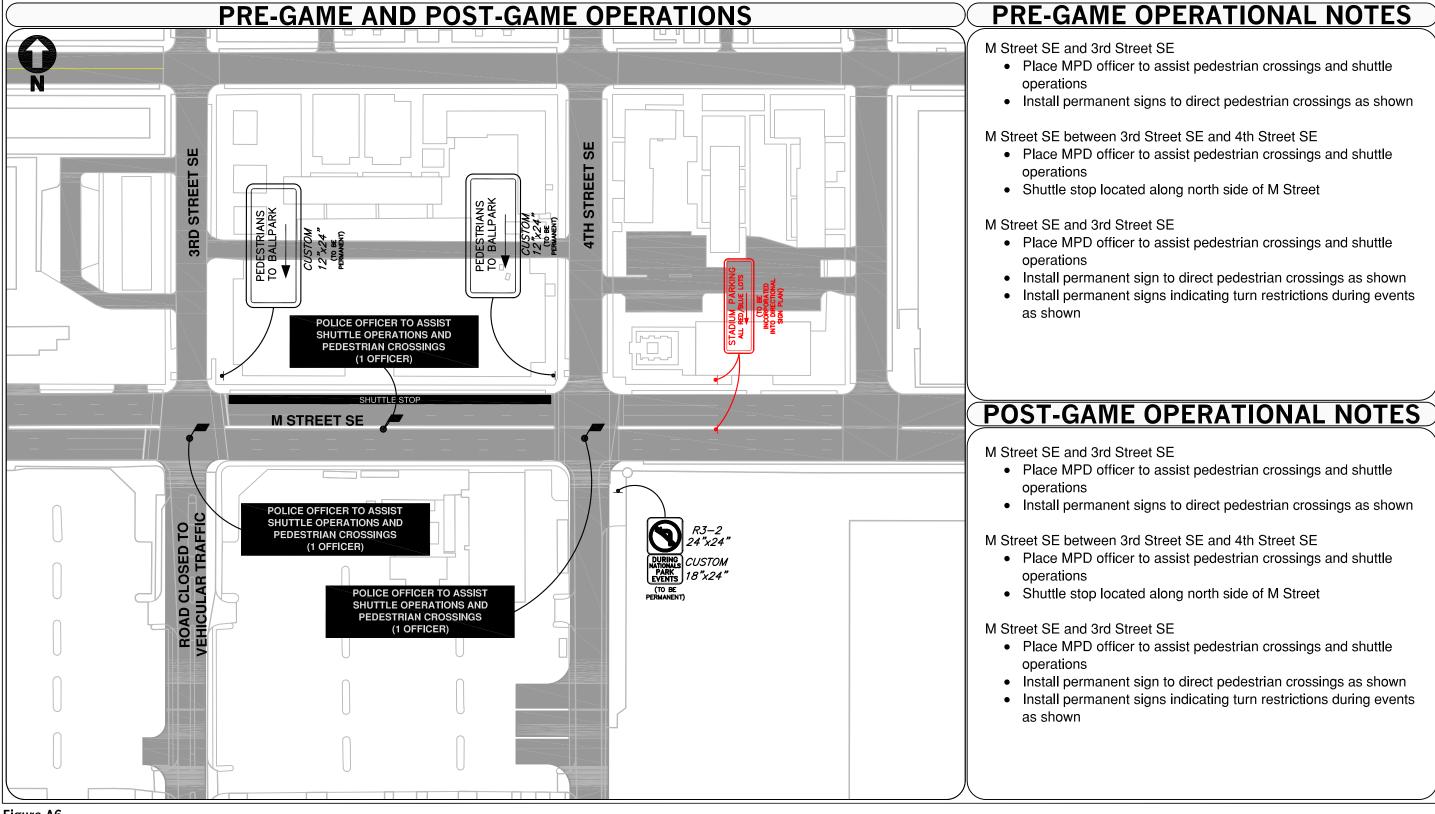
Operations Plan Sheets J & K M Street S.E. at 3rd Street S.E. / 4th Street S.E. Scale: 1"=100' March 12, 2008
